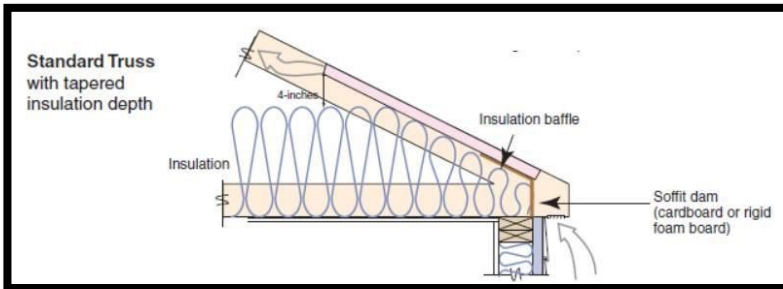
Standard truss with attic space. Source: [Attic Eave Minimum Insulation | Building America Solution Center \(pnnl.gov\)](#)
